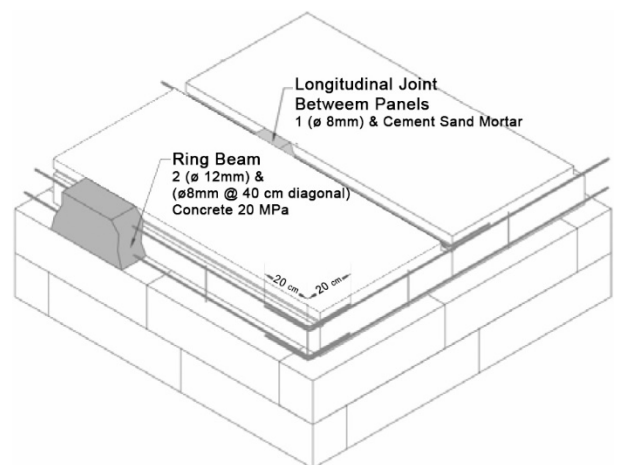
Typical reinforcement for ring beam and longitudinal joints.
